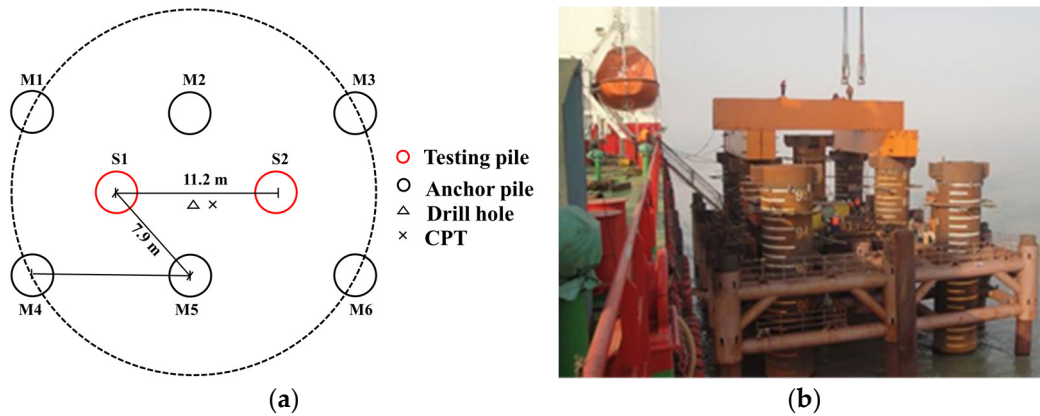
Layout of in situ test. (a) Arrangement schematic diagram of offshore testing piles. (b) Site operation of offshore testing pile.
